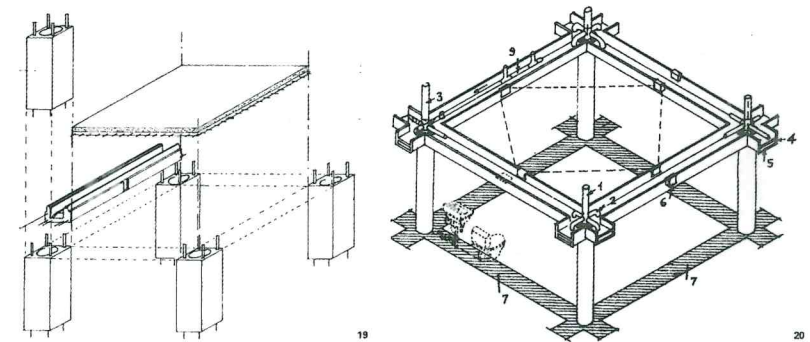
Prefabricated C shaped reinforced concrete system for Les Marelles development (Source: Carini A. et alii, *Housing in Europa seconda parte 1960-1979*, Luigi Parma, Bologna, p. 327,1979).
